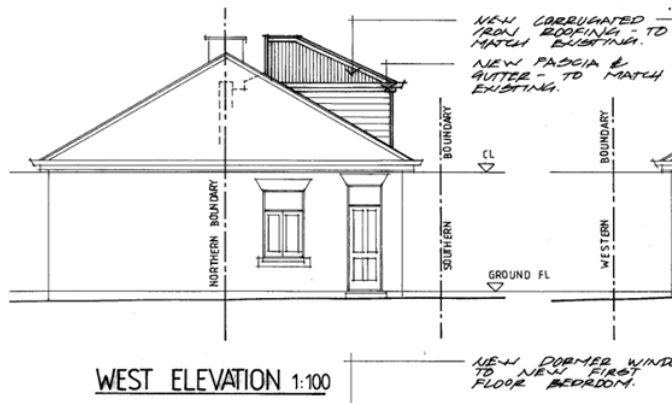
Western (front) elevation of the previously refused application PLN-16-00492.
